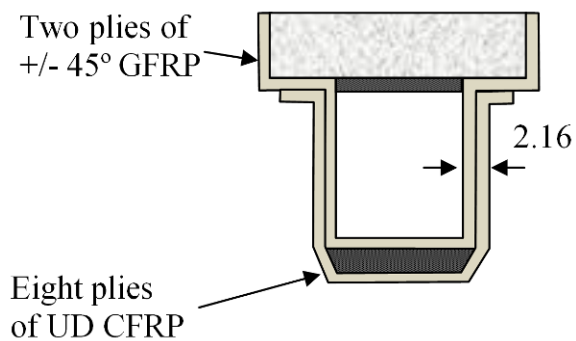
FRP box beam with concrete compression flange (after [106])
